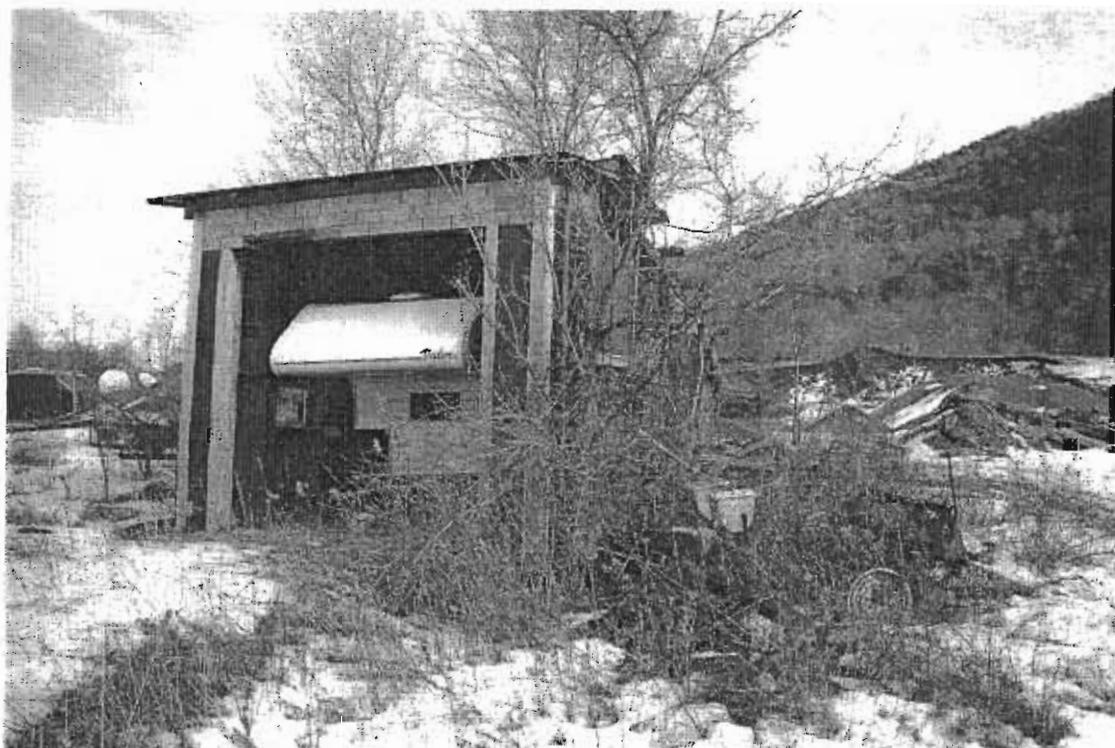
Portion of panoramic view from the proposed garage location, facing southeast.
